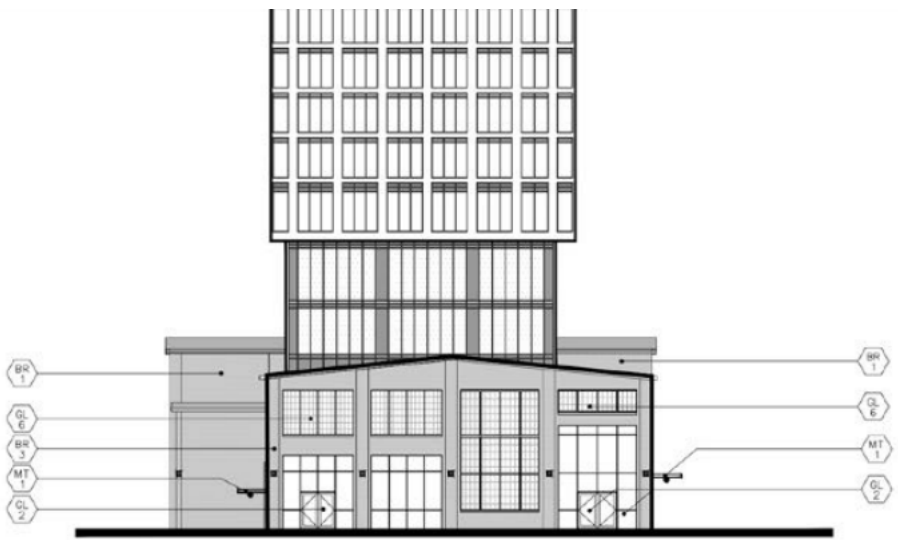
Proposed west elevation of 185 Eastern Avenue (Machine Shop building) (Core Architects Inc., 2026).
